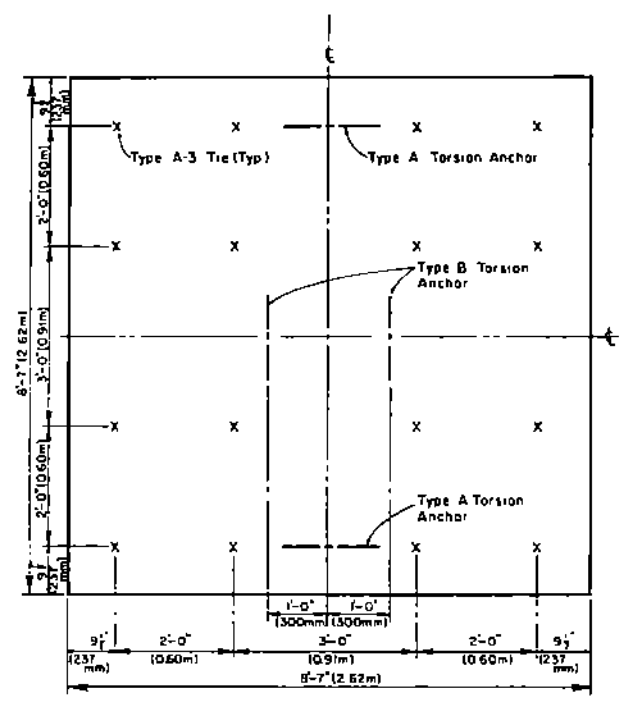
Location of stainless steel torsion anchors and ties in wall P2
